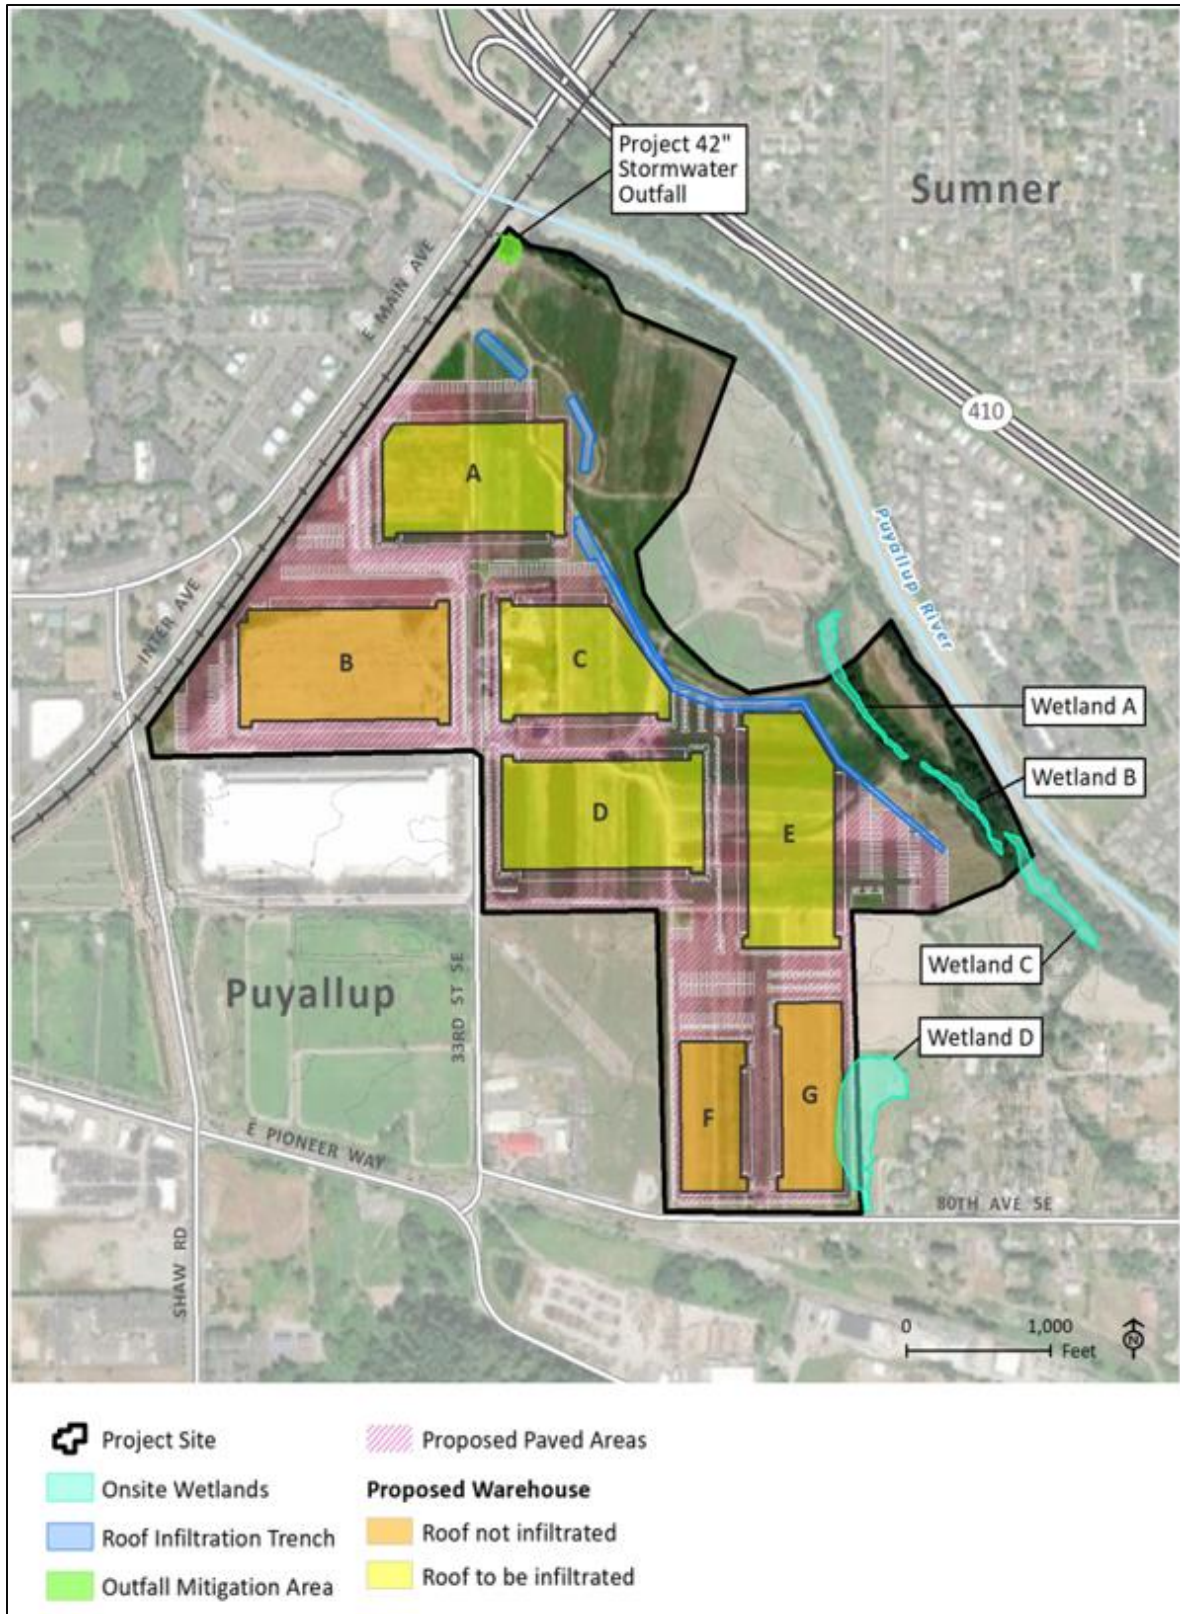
March 2021 Proposed Stormwater Outfall (green), Infiltration Trenches (dark blue), and Wetlands (cyan)
